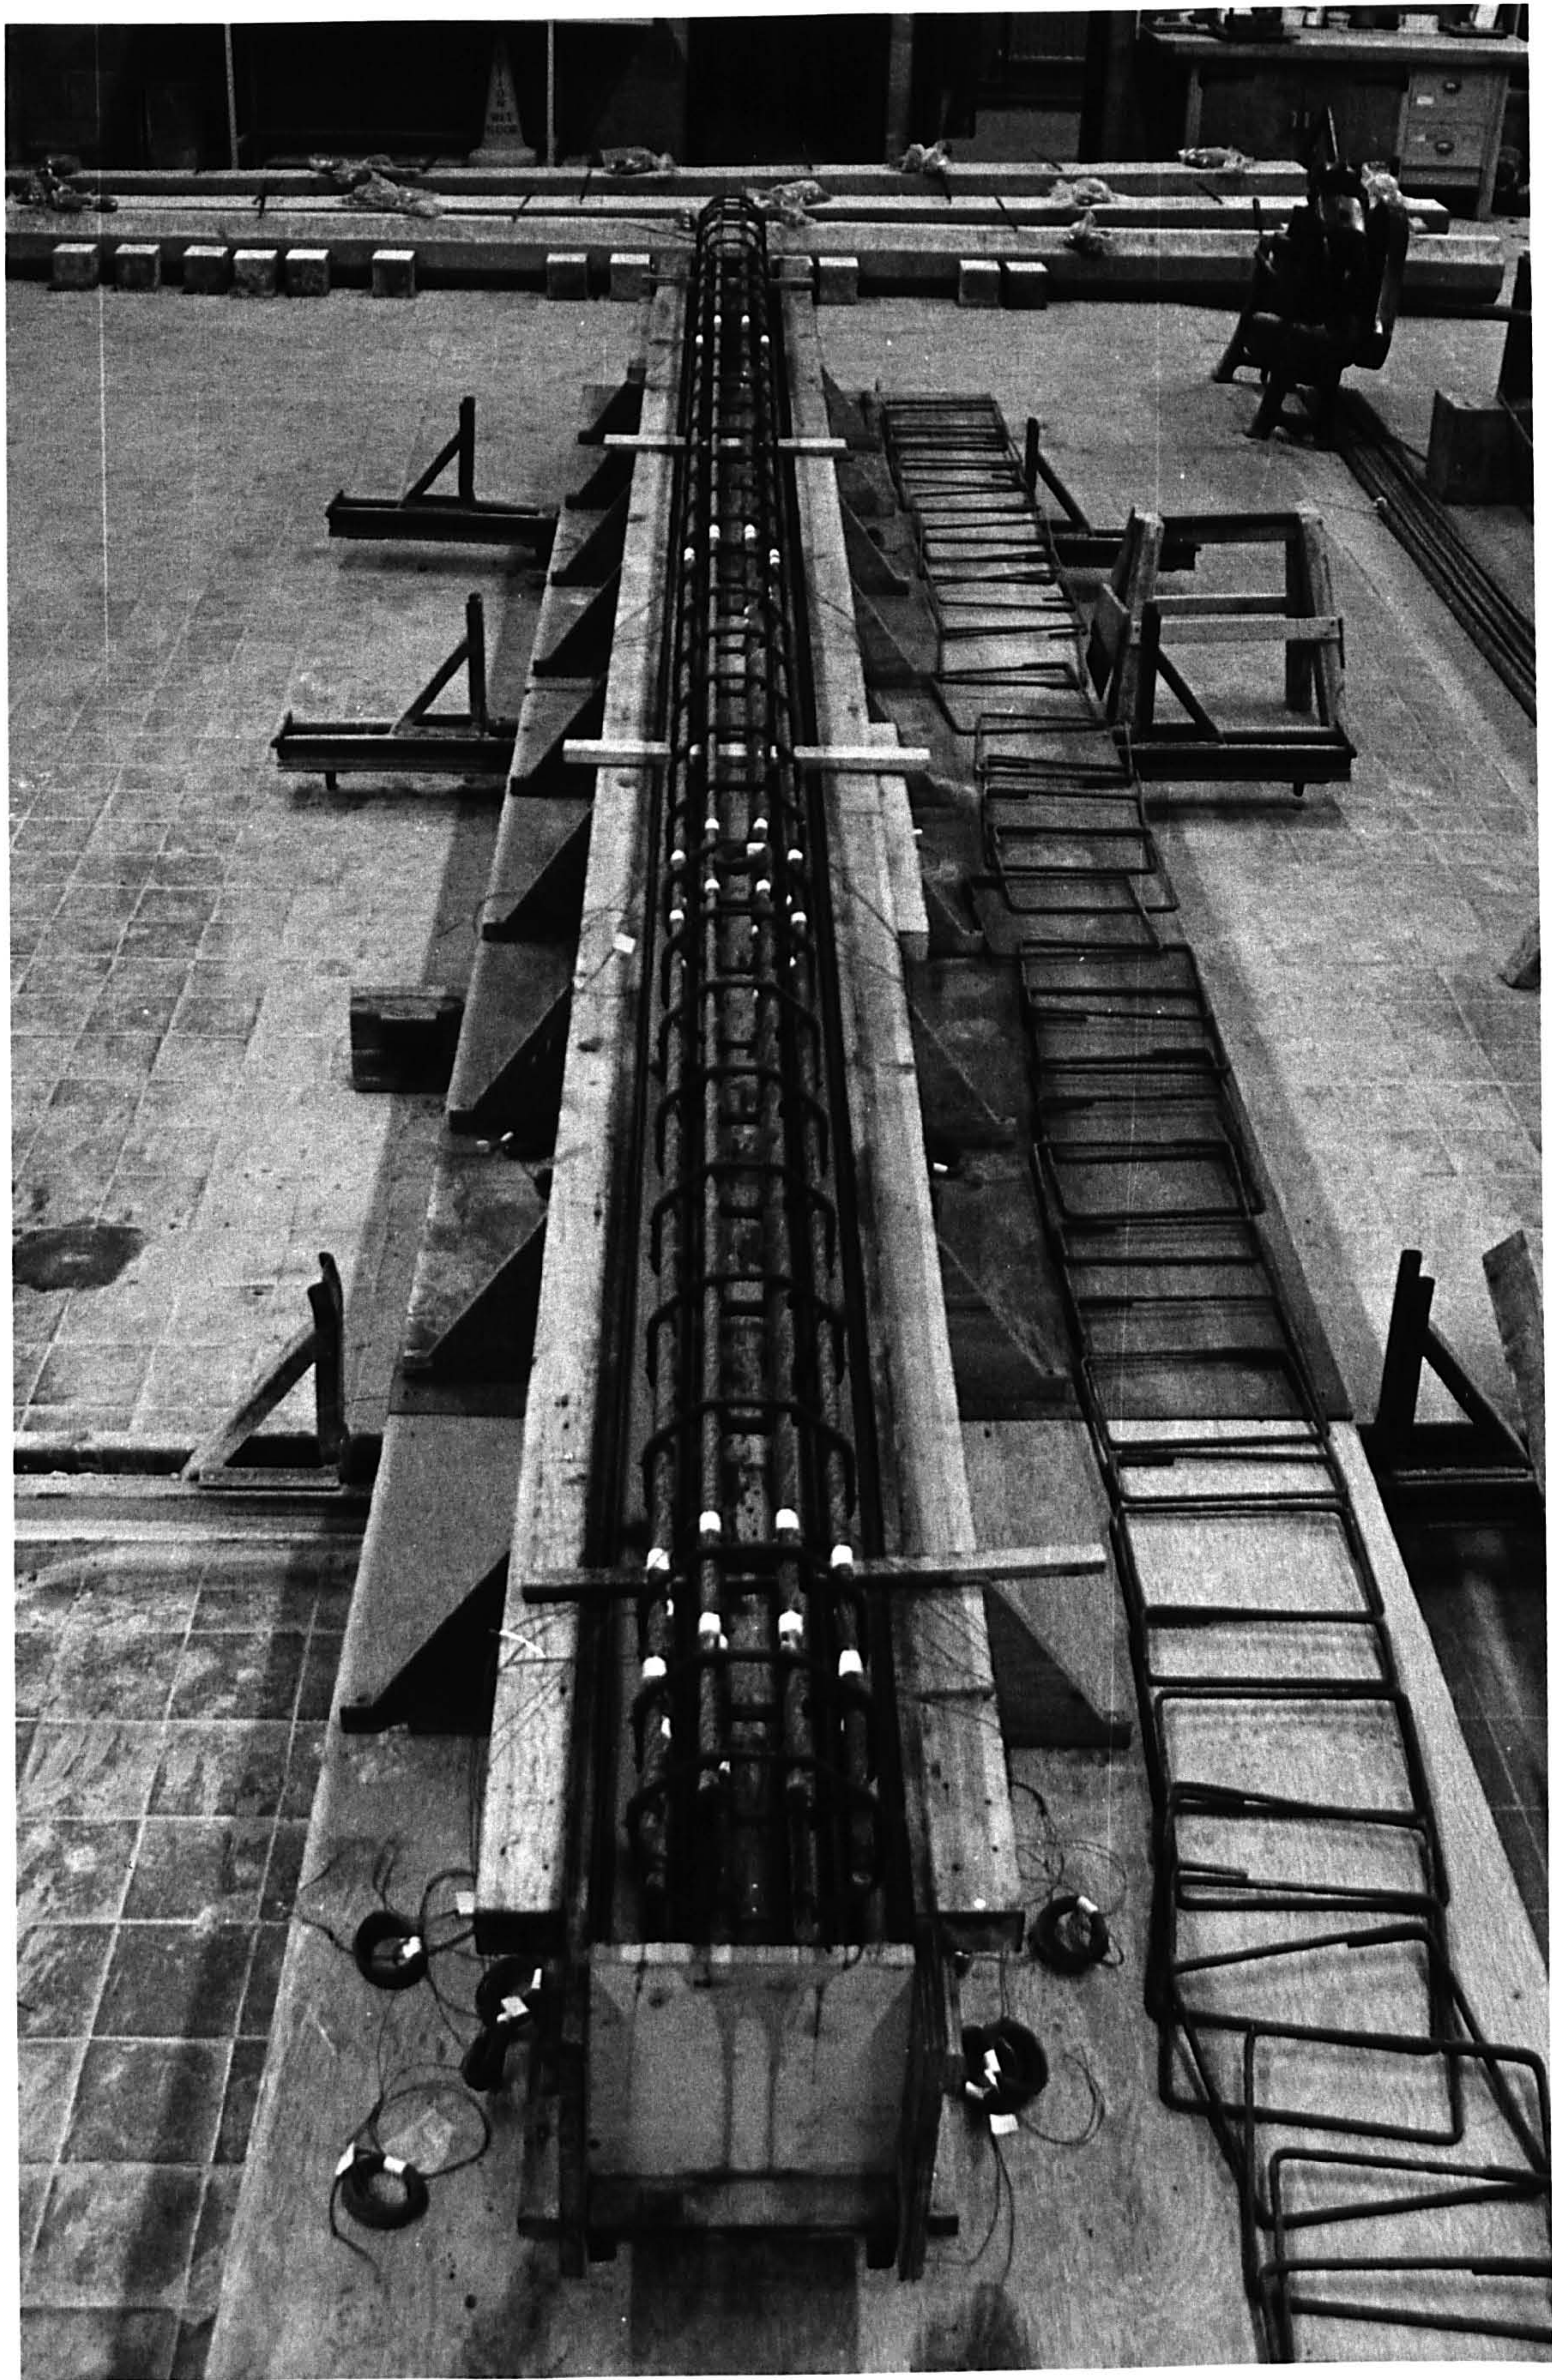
A view of reinforcement cage for octagonal cross section columns
